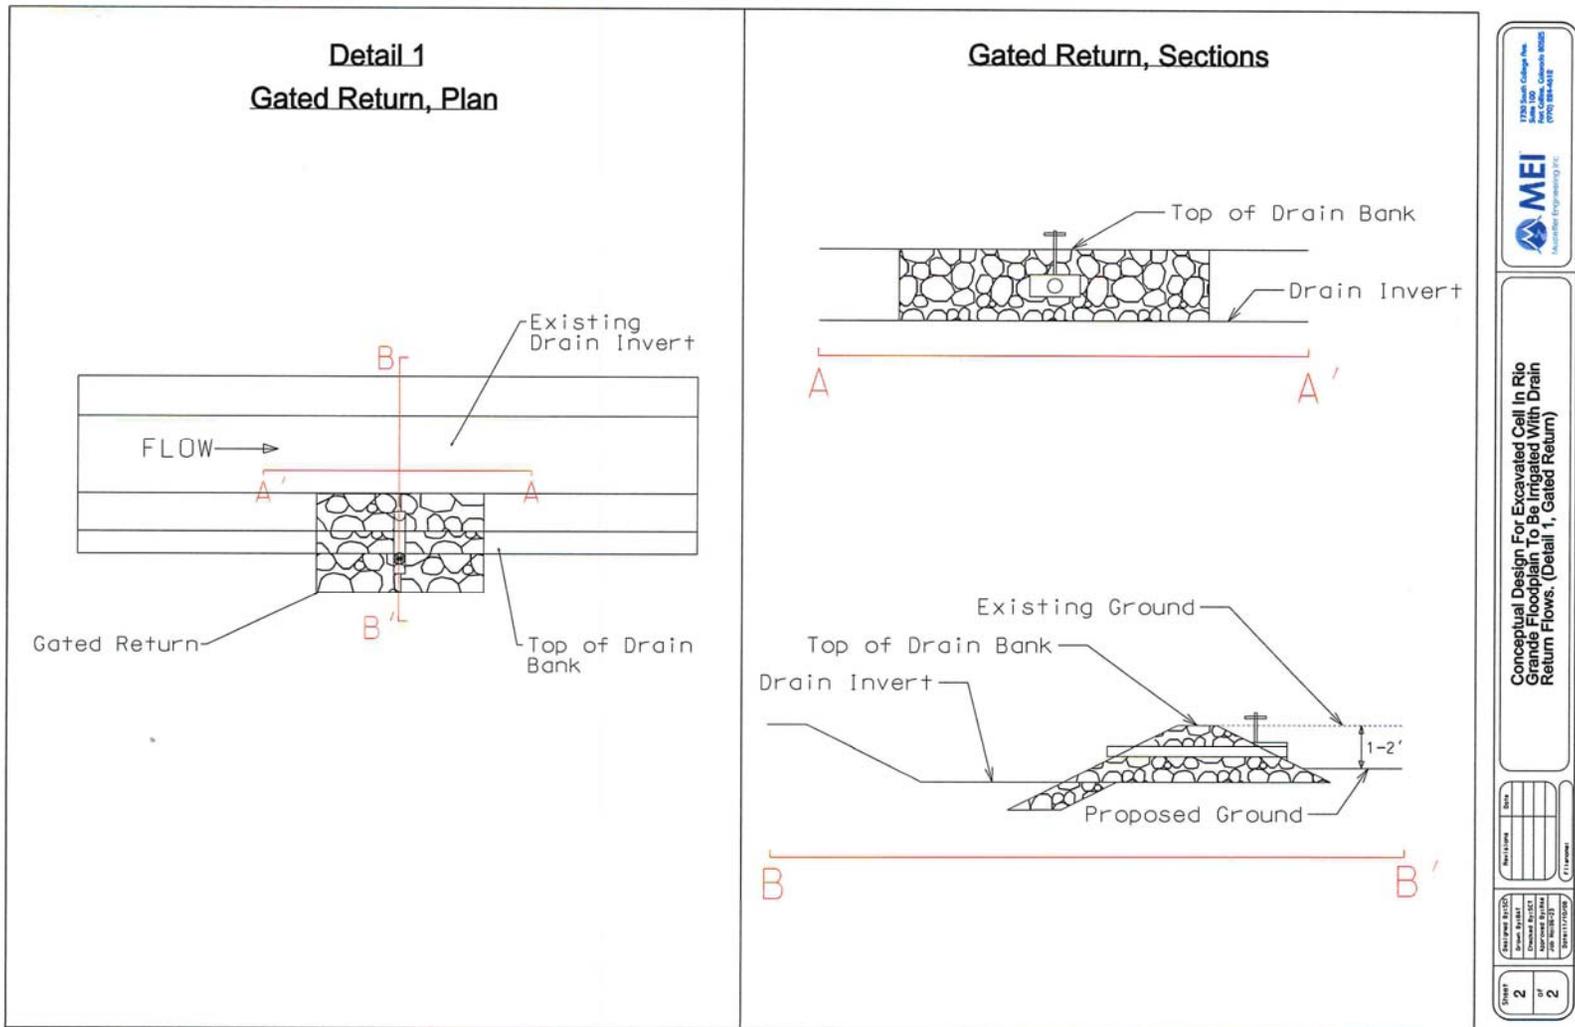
Conceptual design for check structure and turnout to provide overbank irrigation adjacent to irrigation wasteways and drains (continued).
